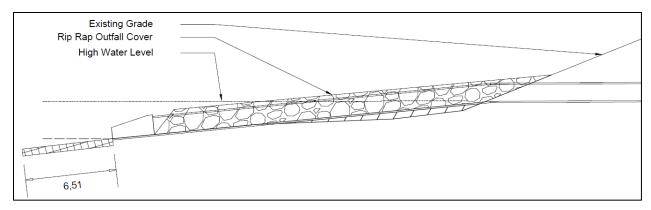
Cross-Section of Outfall Elevation (Source: Michael Louws, 2017)
